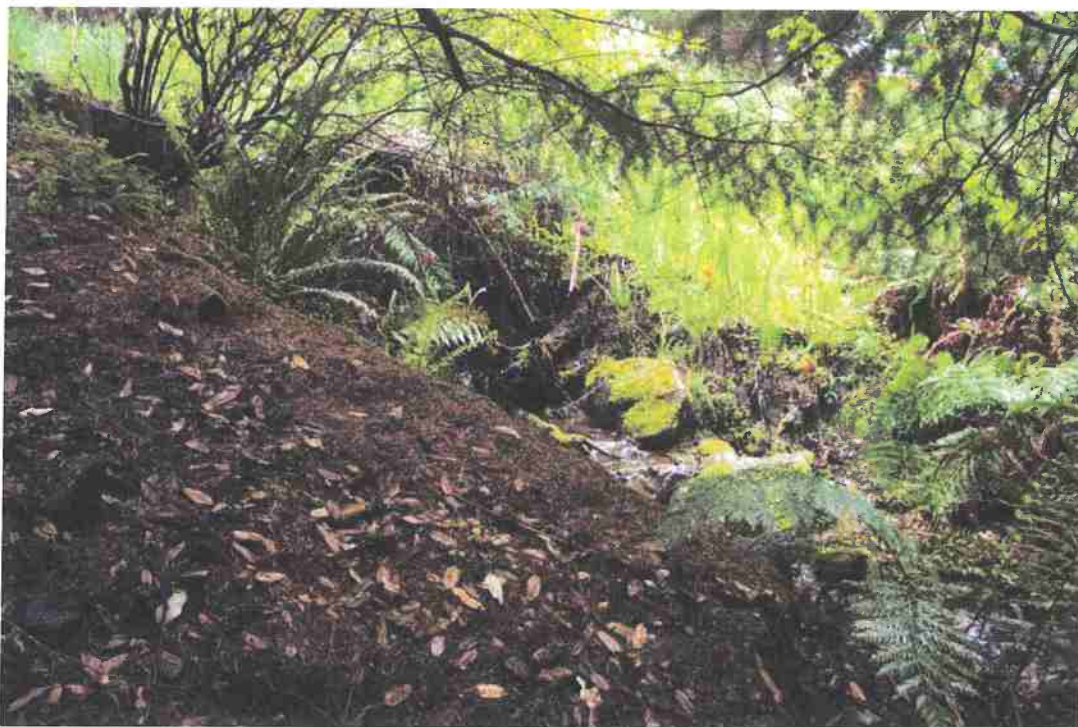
site #103 Grundman Road, before upgrade. This picture was taken from the left bank below the outlet of the culvert. The 30" culvert was undersized and short in the fill with minor erosion occurring at the outlet.
